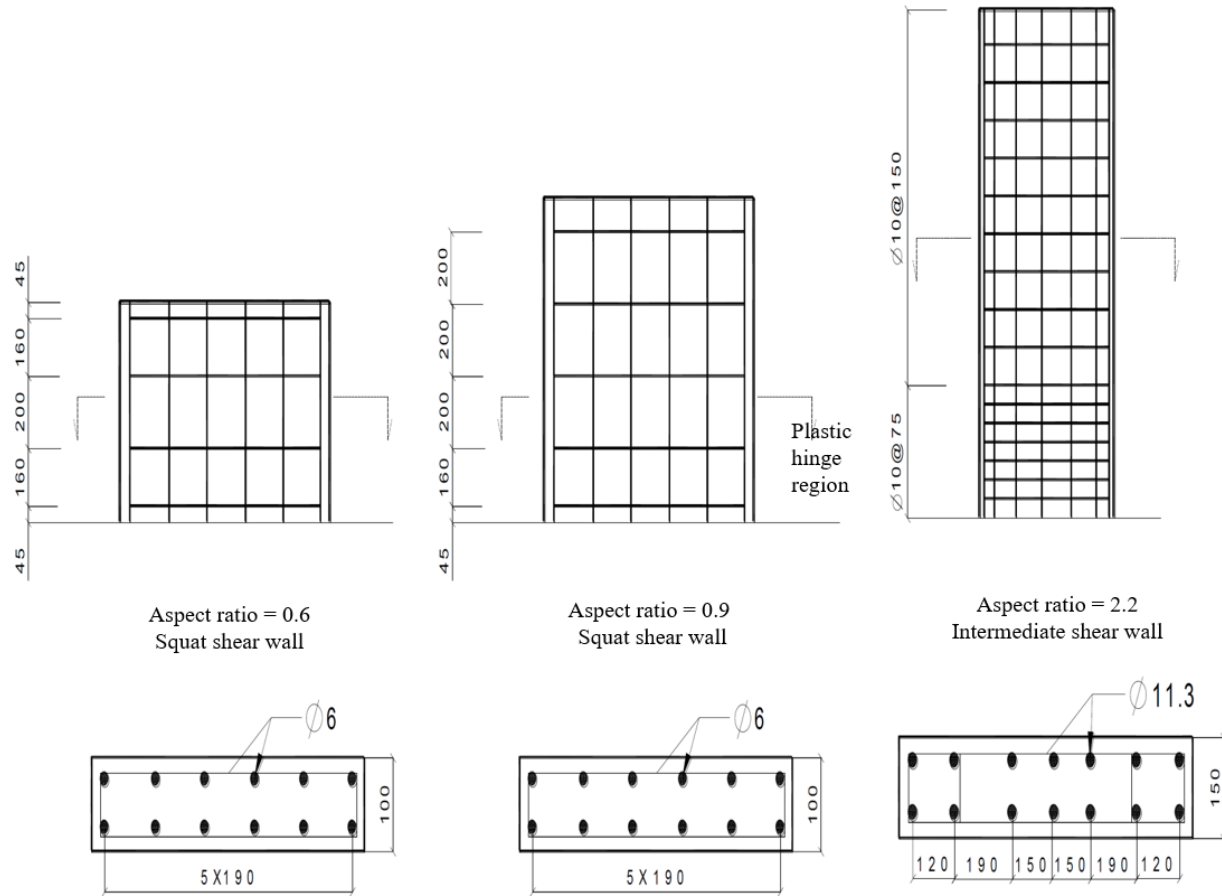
Elevation and cross-section of walls investigated by Abraik and Youssef (2015) (dimension in mm)
